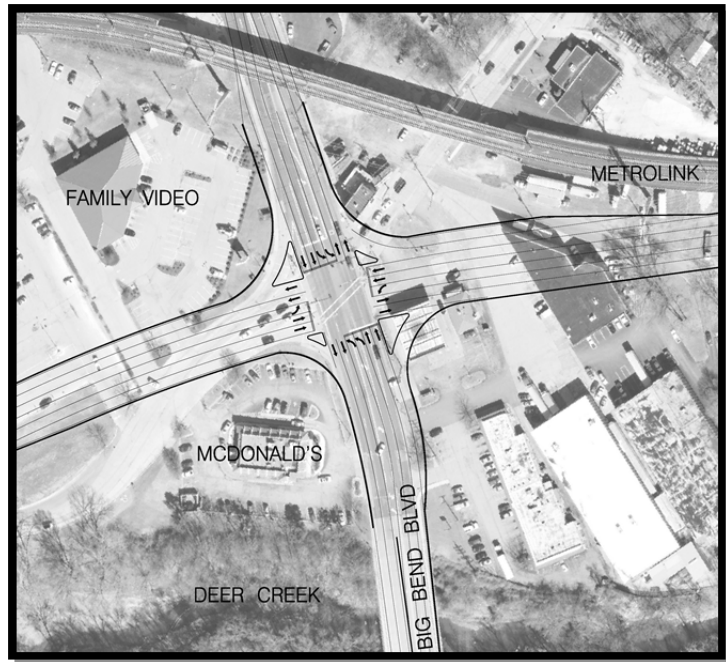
Big Bend Boulevard Intersection - Traditional Intersection with Signals
